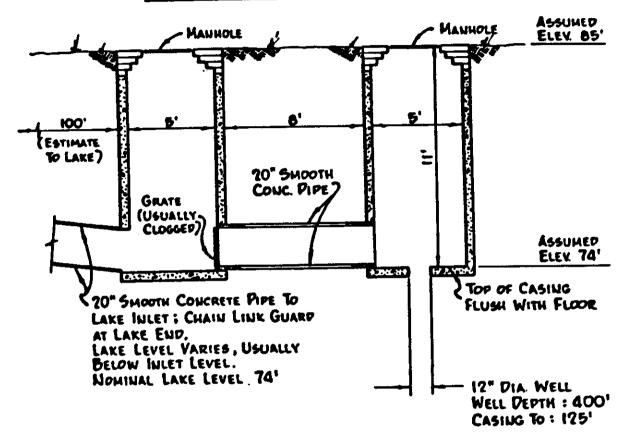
CROSS-SECTION OF 441/436 WELL SITE
